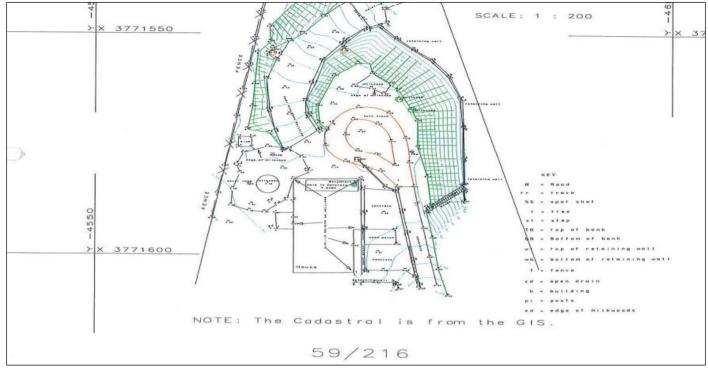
Proposed Managers Cottages (Louw Designs, 2023)
